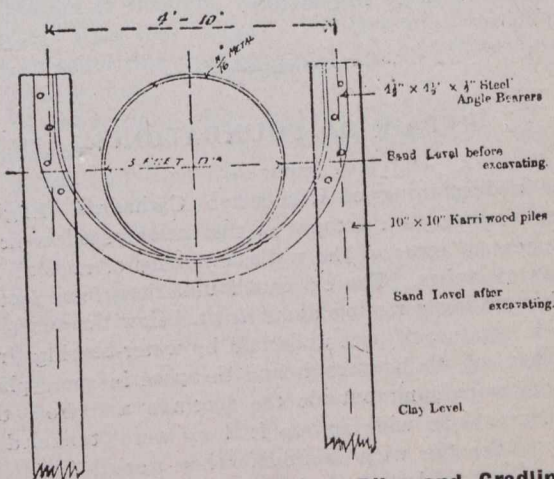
Cross Section Showing Piles and Cradling to Receive Connecting End of Tube.
